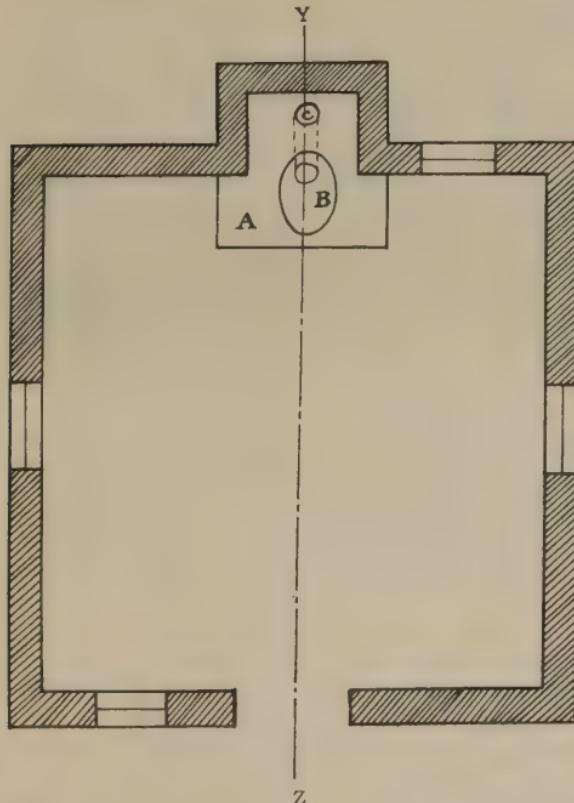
Officer's house (designed by Capt. Geo. B. Lake, M. C.). Ground plan. A, Hearth; B, stove; C, chimney. Scale $\frac{1}{4}$ inch = 1 foot.
